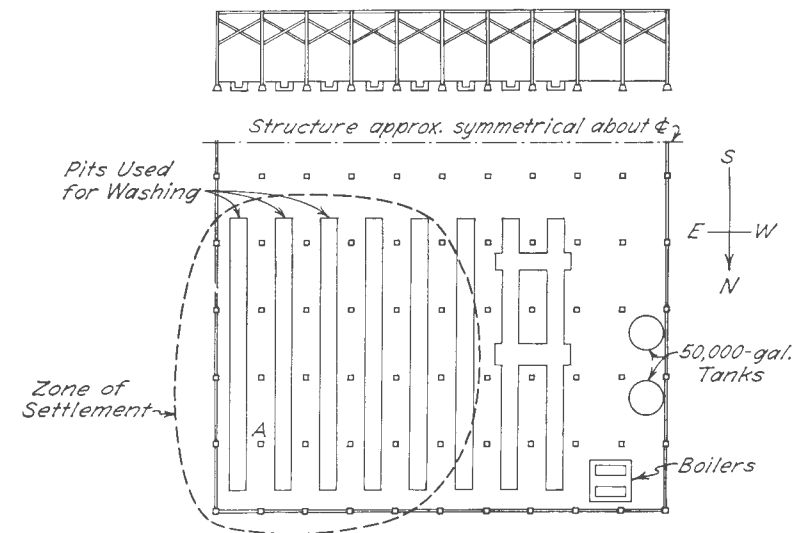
PLAN OF STRUCTURE WHOSE SUBSIDENCE DUE TO LOESS SUBSOIL WAS STUDIED
